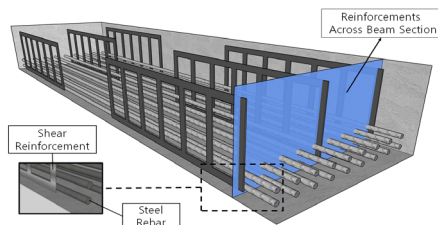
Schematic view of a wide beam reinforced with plate with openings
